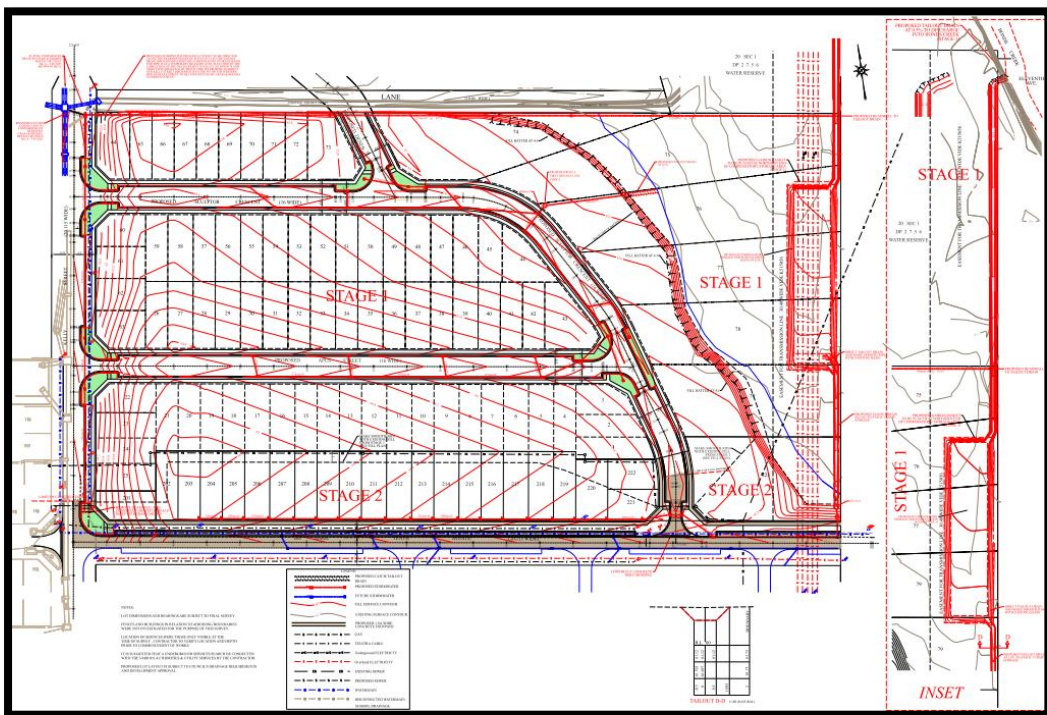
Stage 2 Engineering Plans Showing Proposed Centrelines (Source: R. S. Canceri)
